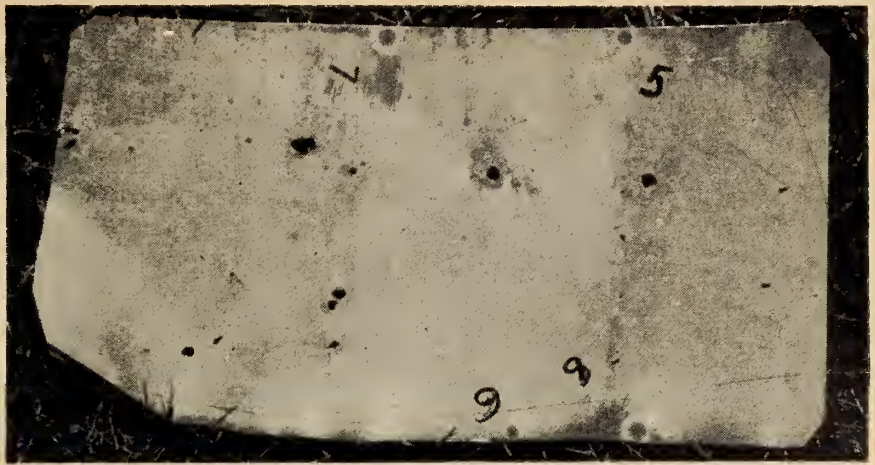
Close-up view of corroded parapet flashing.
